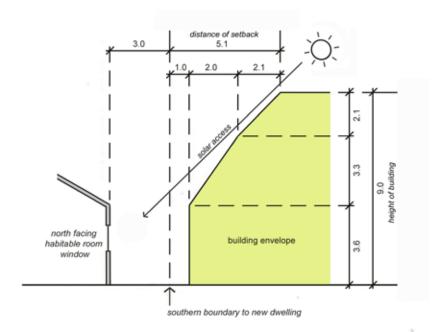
A north-facing habitable room window means a window with an axis perpendicular to its surface oriented north 30 degrees west to north 30 degrees east.
